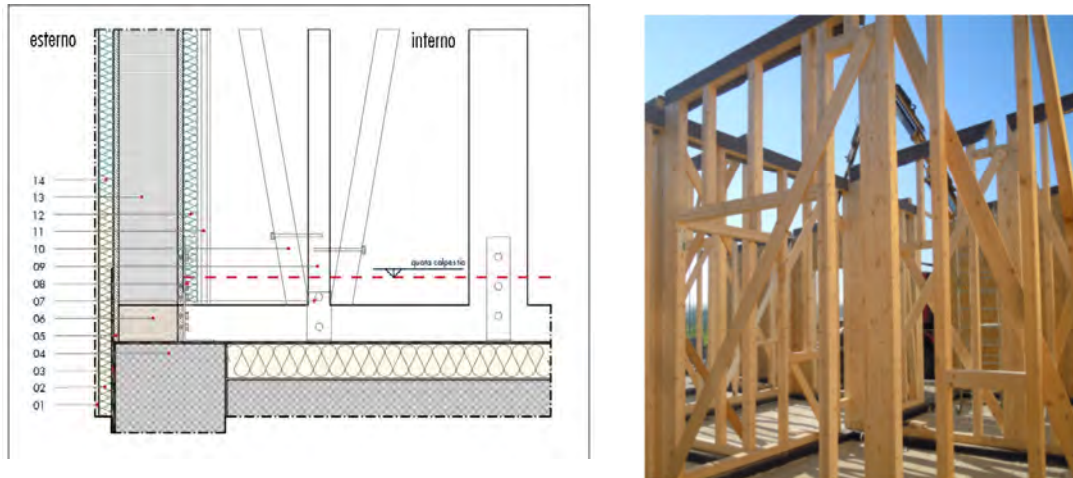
Flower House. High performing wooden – stratified layer envelope is made of: 01 External thermal insulation wooden fiber cm 4 Thermal coat in wood fiber with shaving 02 XPS insulation layer 03 Waterproofing sheath 04 Concrete foundation 05 OSB multilayer panel 06 Lamellar starting crosspiece 07 L shaped metallic stirrups 08 Torx screws 09 Upright 10 Bracing 11 Double plasterboard panels 12. Internal rock wool insulation layer 13. Insulation inside the frame 8+8 cm wood fiber and rock wool.
